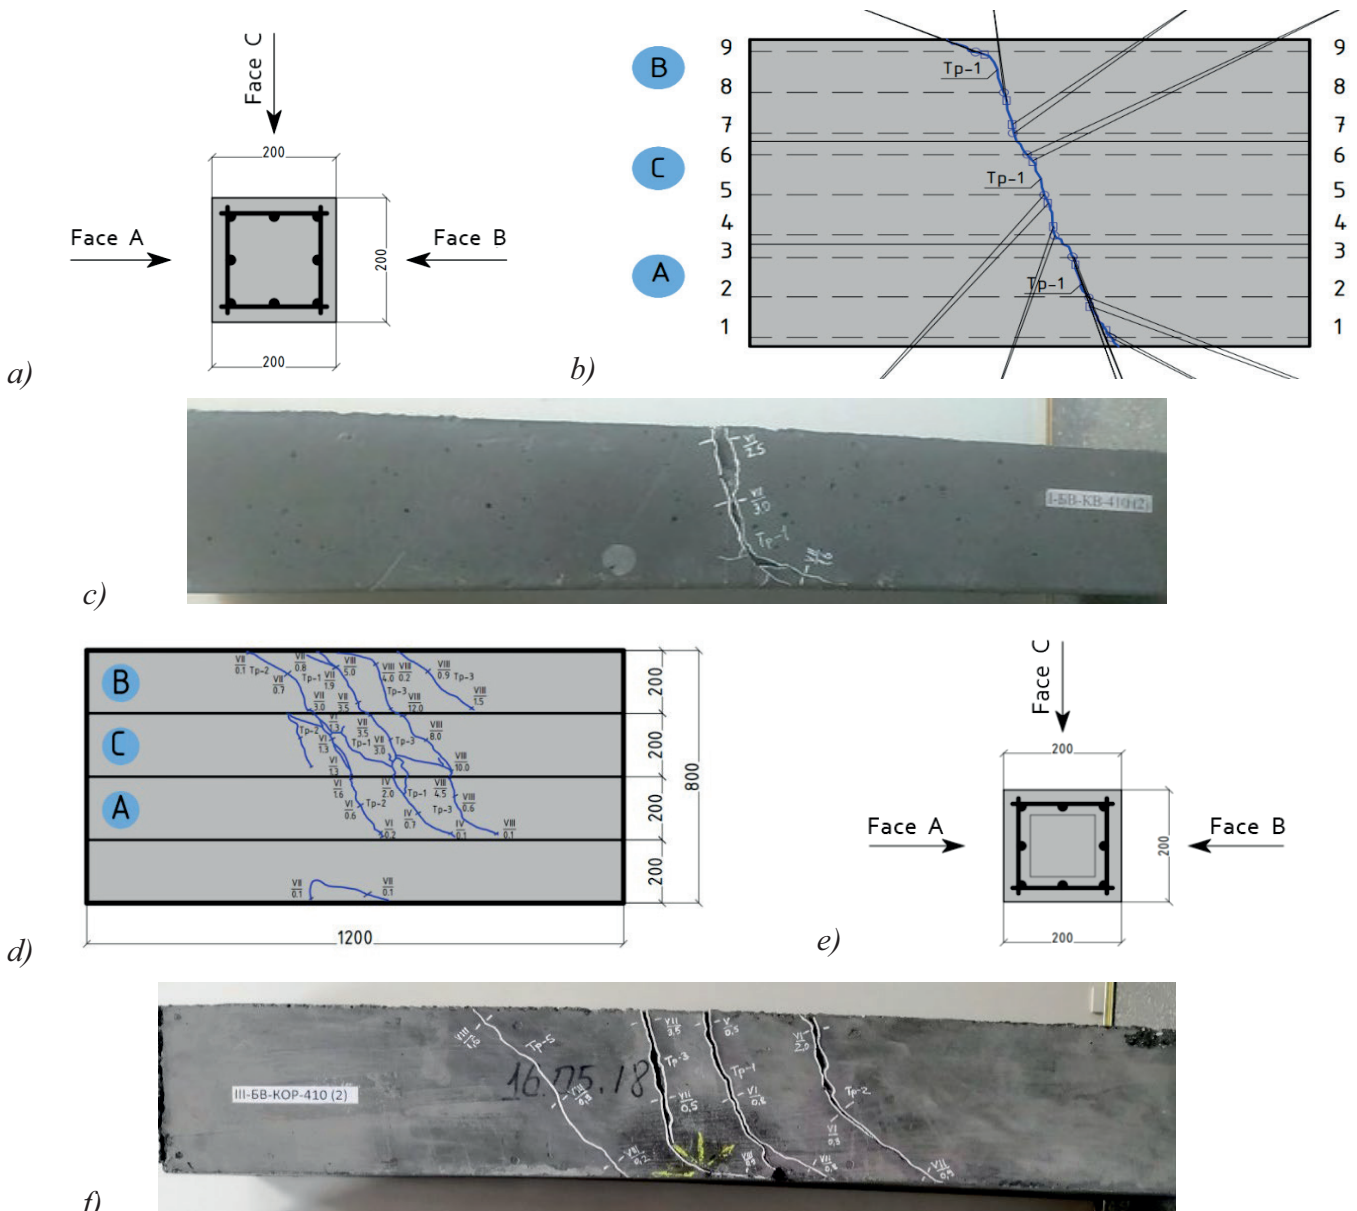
Cross section of a solid beam (a), a pattern of a single crack sweep (b) and a general view of a crack from a side face (c); d, e, f- the same for a box section beam
